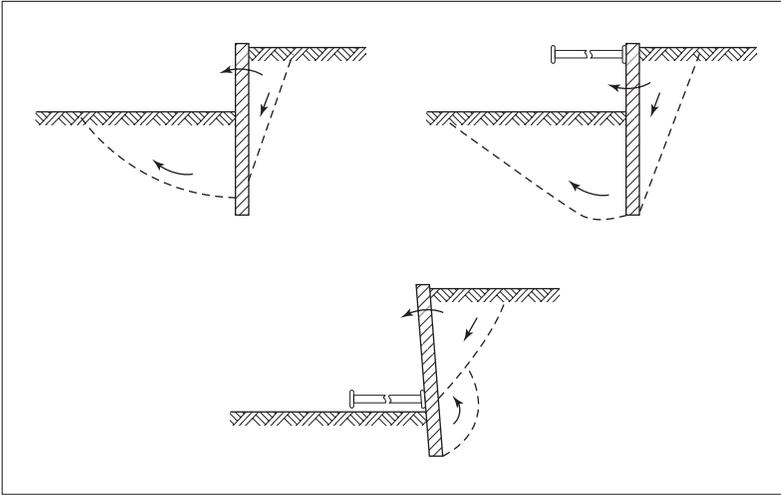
Examples of limit modes for rotational failure of embedded walls (after Section 9.7.4 EC7 Part 1)
